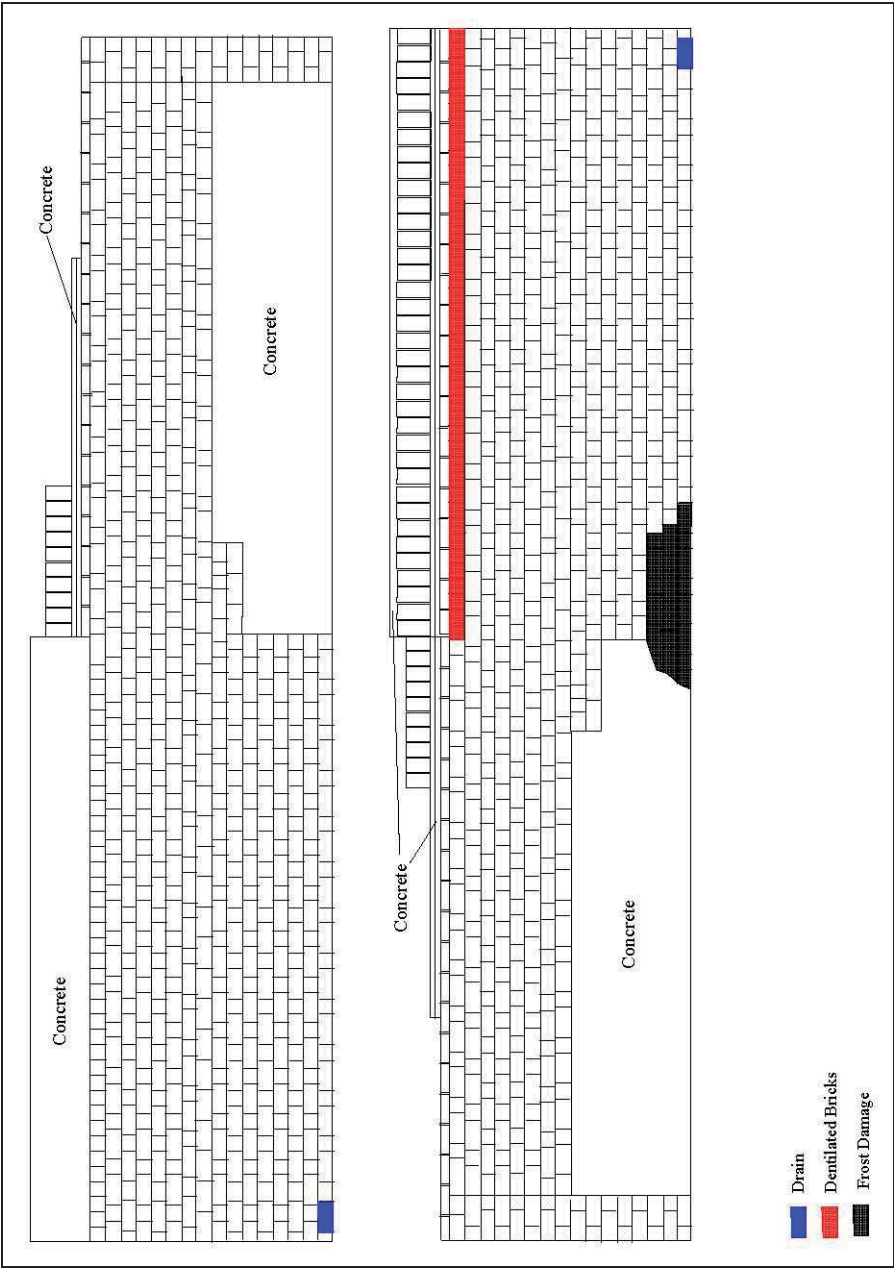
Elevations of Boundary Wall (Scale 1:50)
